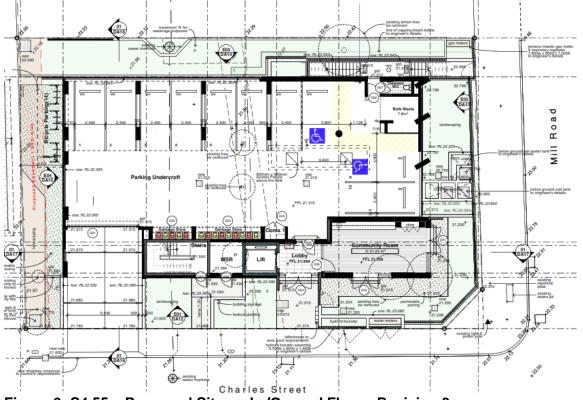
S4.55 – Proposed Siteworks/Ground Floor - Revision 3
